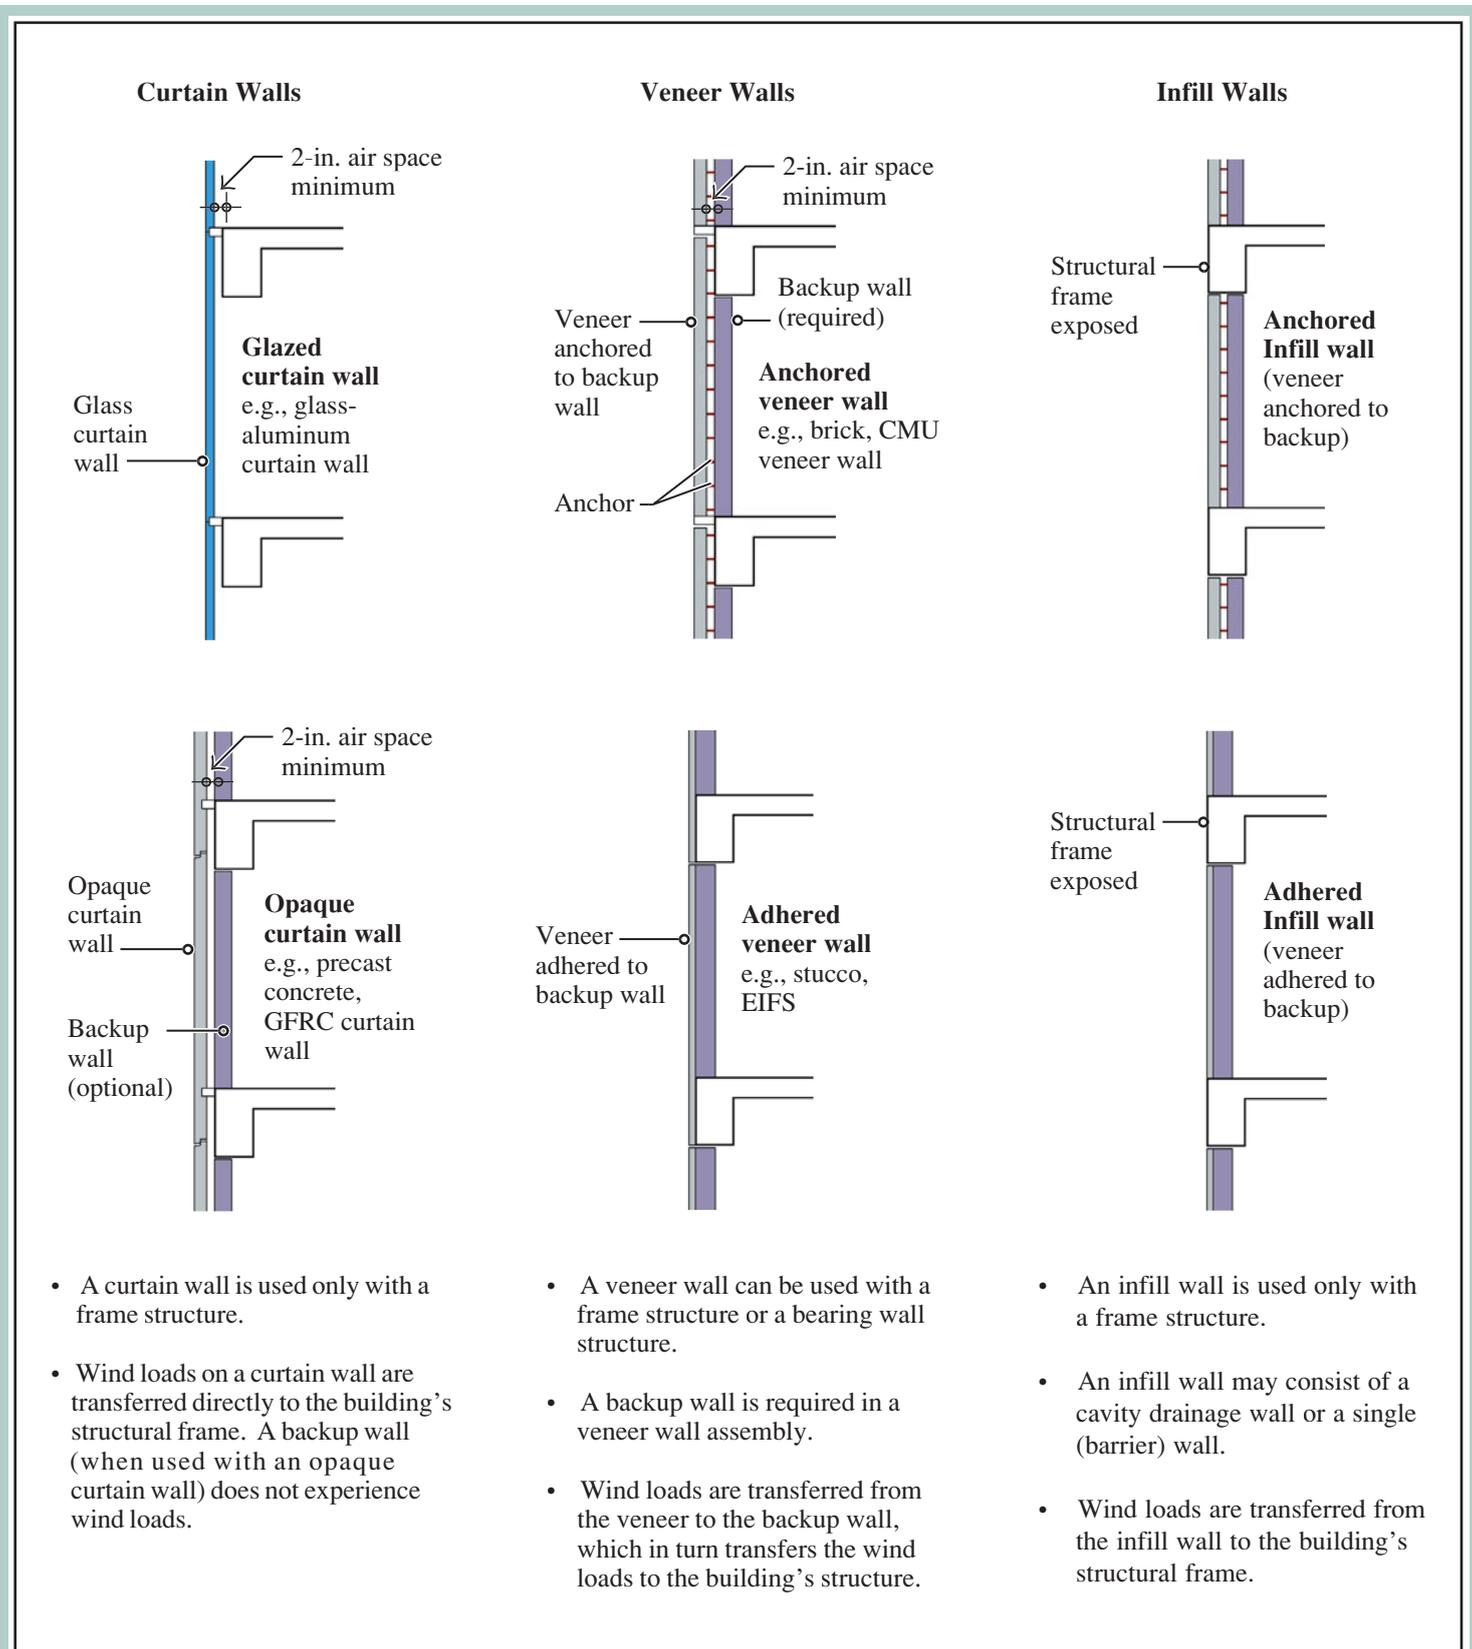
Curtain wall, veneer wall, and infill wall defined.
